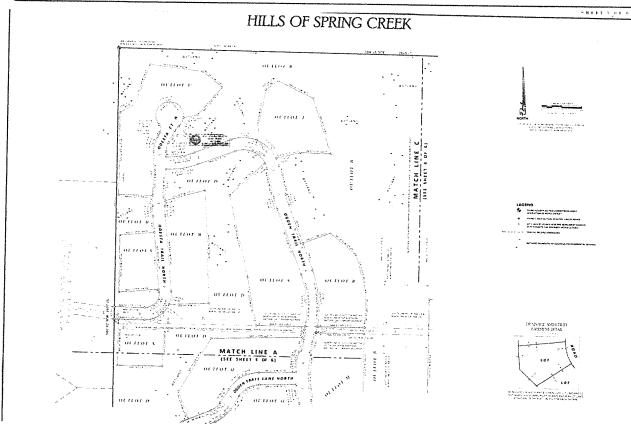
# EXHIBIT B DECLARATION OF MINIMUM BASEMENT FLOOR ELEVATIONS
